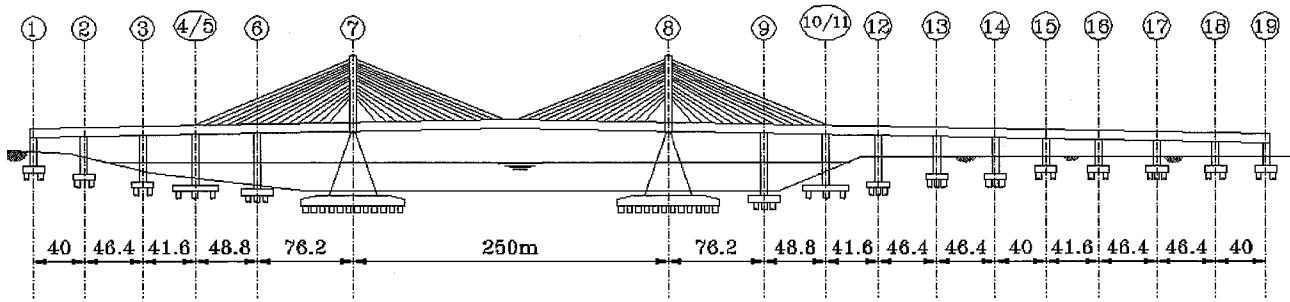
General layout for Aswan Cable-Stayed Bridge over the Nile
